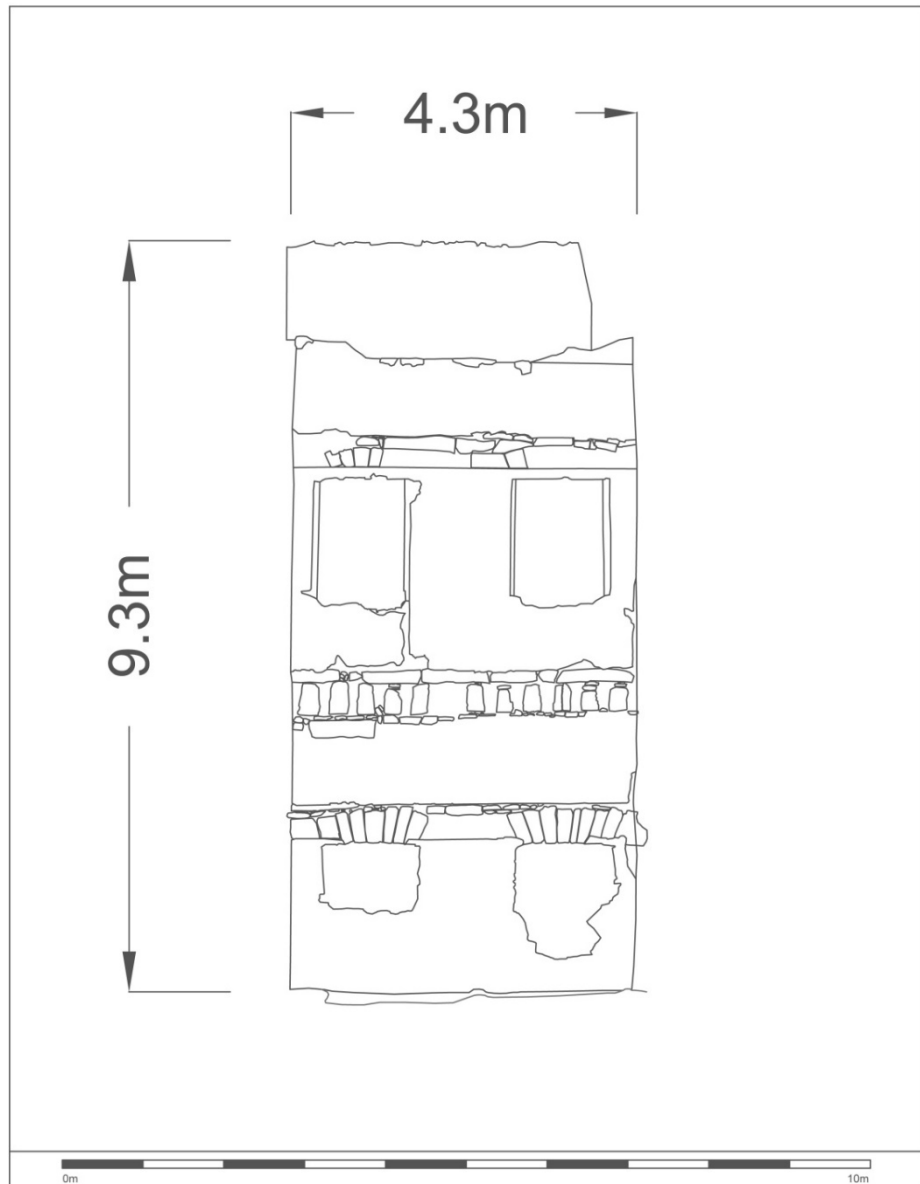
Internal elevation of the north-west wall of the signal tower at Inisheer Signal Station.
